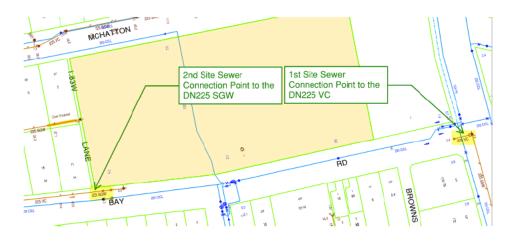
Sydney Water sewer DBYD plan (Source: LCI)
